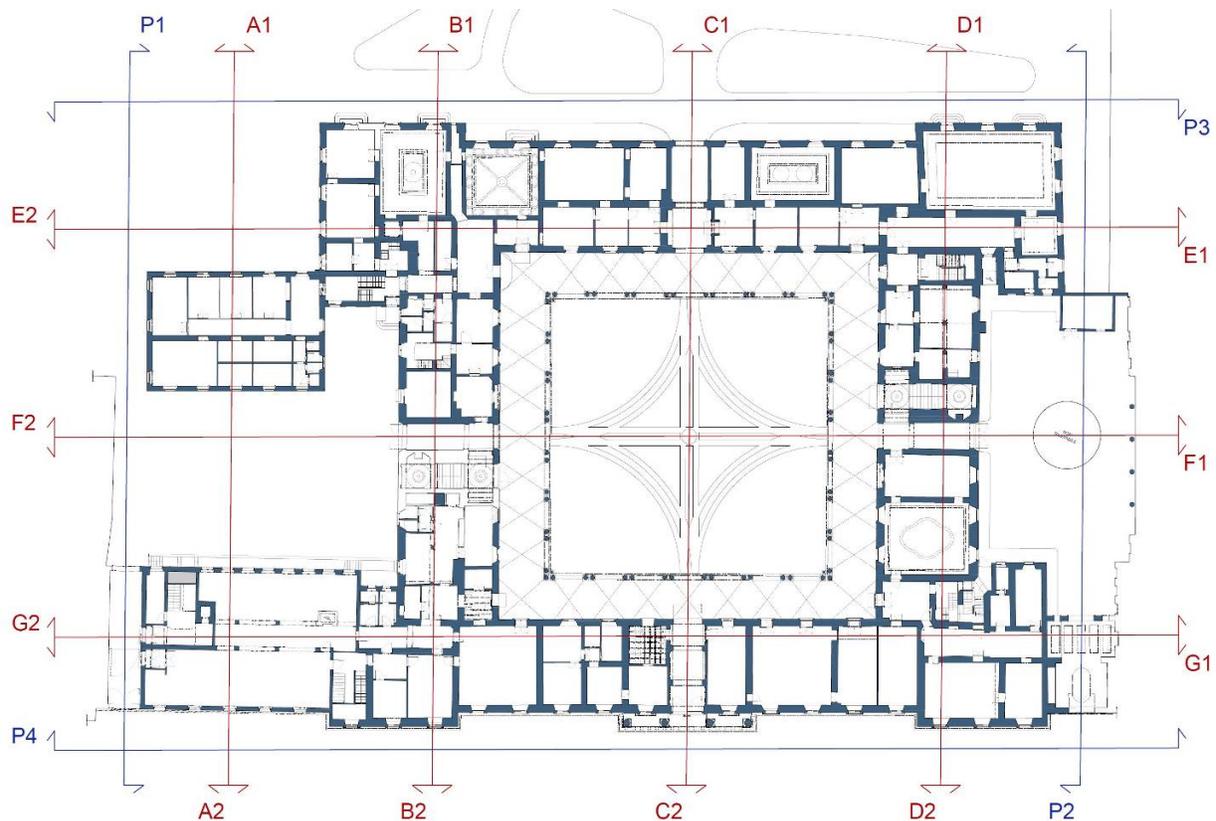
Indication of the vertical section planes: double-sided sections and elevations, based on the planimetric basis of the ground floor.
